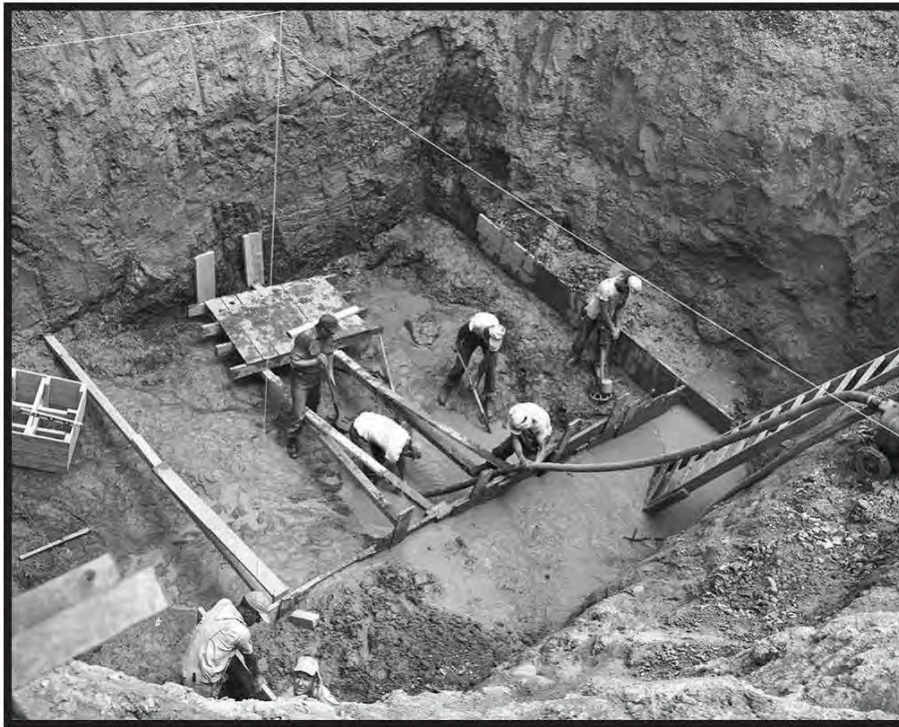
Excavation Work for the X-600 Steam Plant, June 1953
